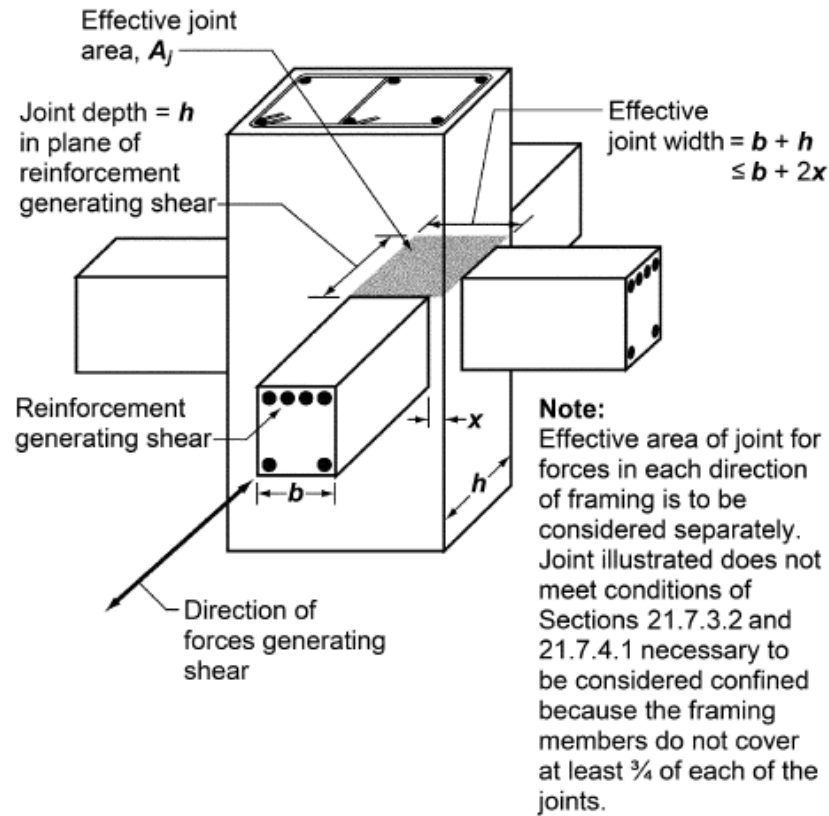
Effective Joint Width and Effective Joint Area (ACI 352R-02)
